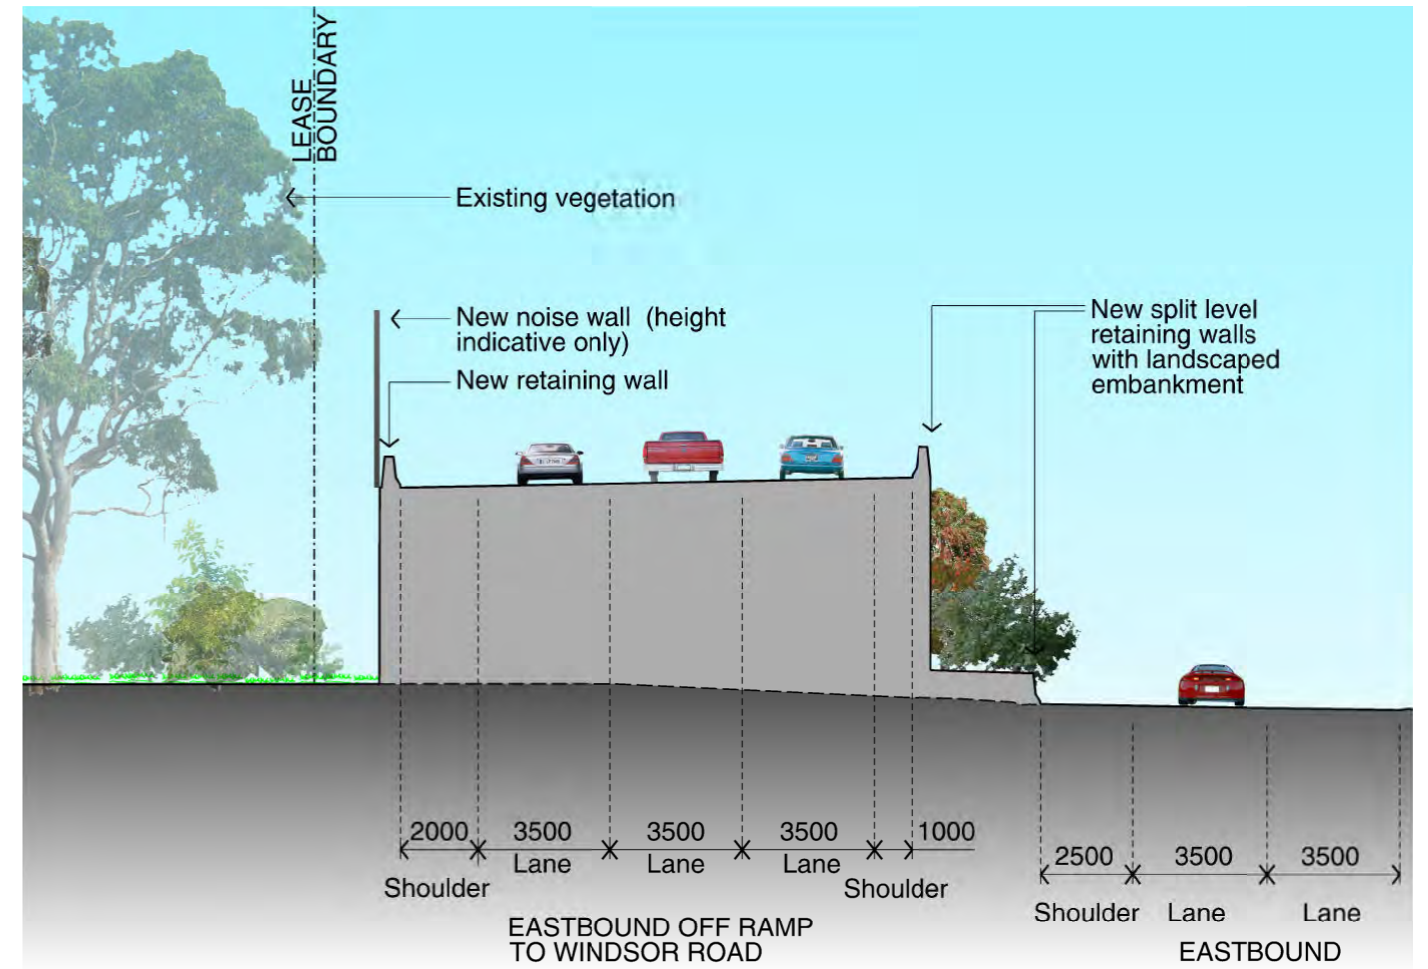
Stn 3850 Windsor Road off ramp (eastbound) - Proposed
